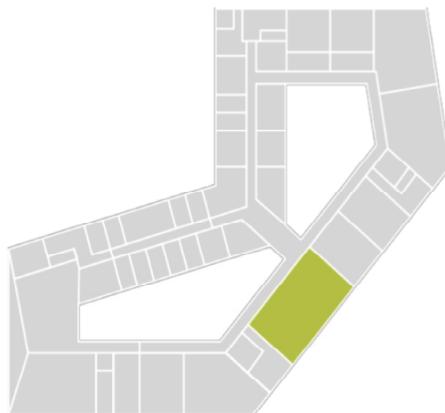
Floor plan of the building, indicating the location of the idea lab within the innovation center (image: Science Park Kassel, with permission).
